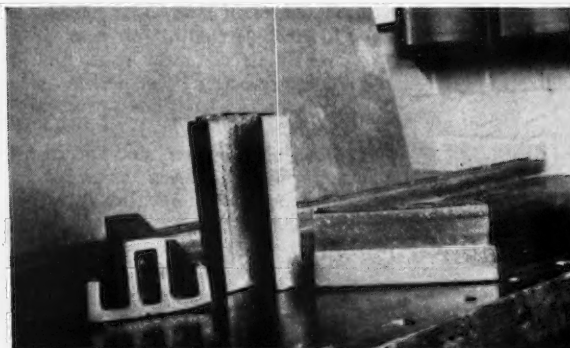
(LEFT) THE NEW TYPE FLOOR CONSTRUCTION CONSISTS OF PRECAST TILE BEAMS OR JOISTS WITH FLOOR TILE FILLERS OR SPAN TILE EXTENDING FROM ONE BEAM TO THE NEXT. FIG. 2 (BELOW, LEFT) BEAM TILE USED IN THE EXPERIMENTAL STAGES. FIG. 3 (BELOW, RIGHT) PLACING REINFORCING BARS IN THE TWO CHANNELS FORMED BY THE BEAM TILE
